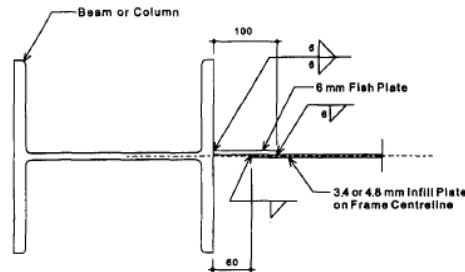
Wall steel plate-to-column welded connection (after Driver *et al.*, 1998).
